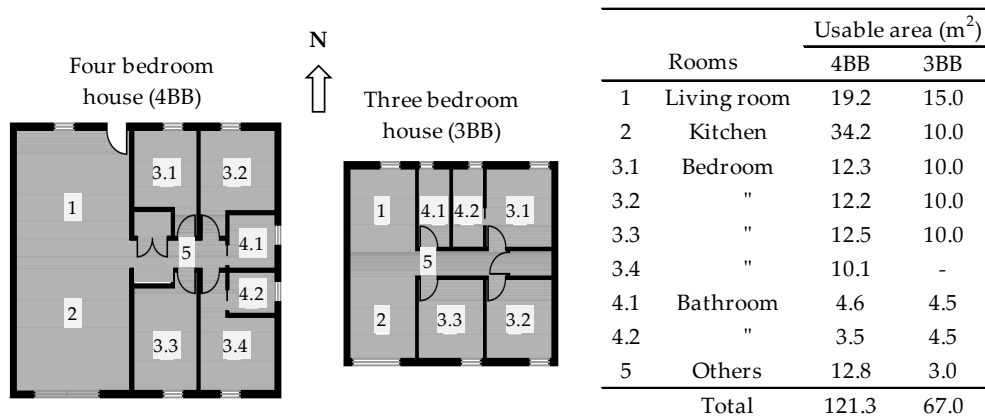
House layout: four-bedroom building (4BB) and three-bedroom building (3BB).
